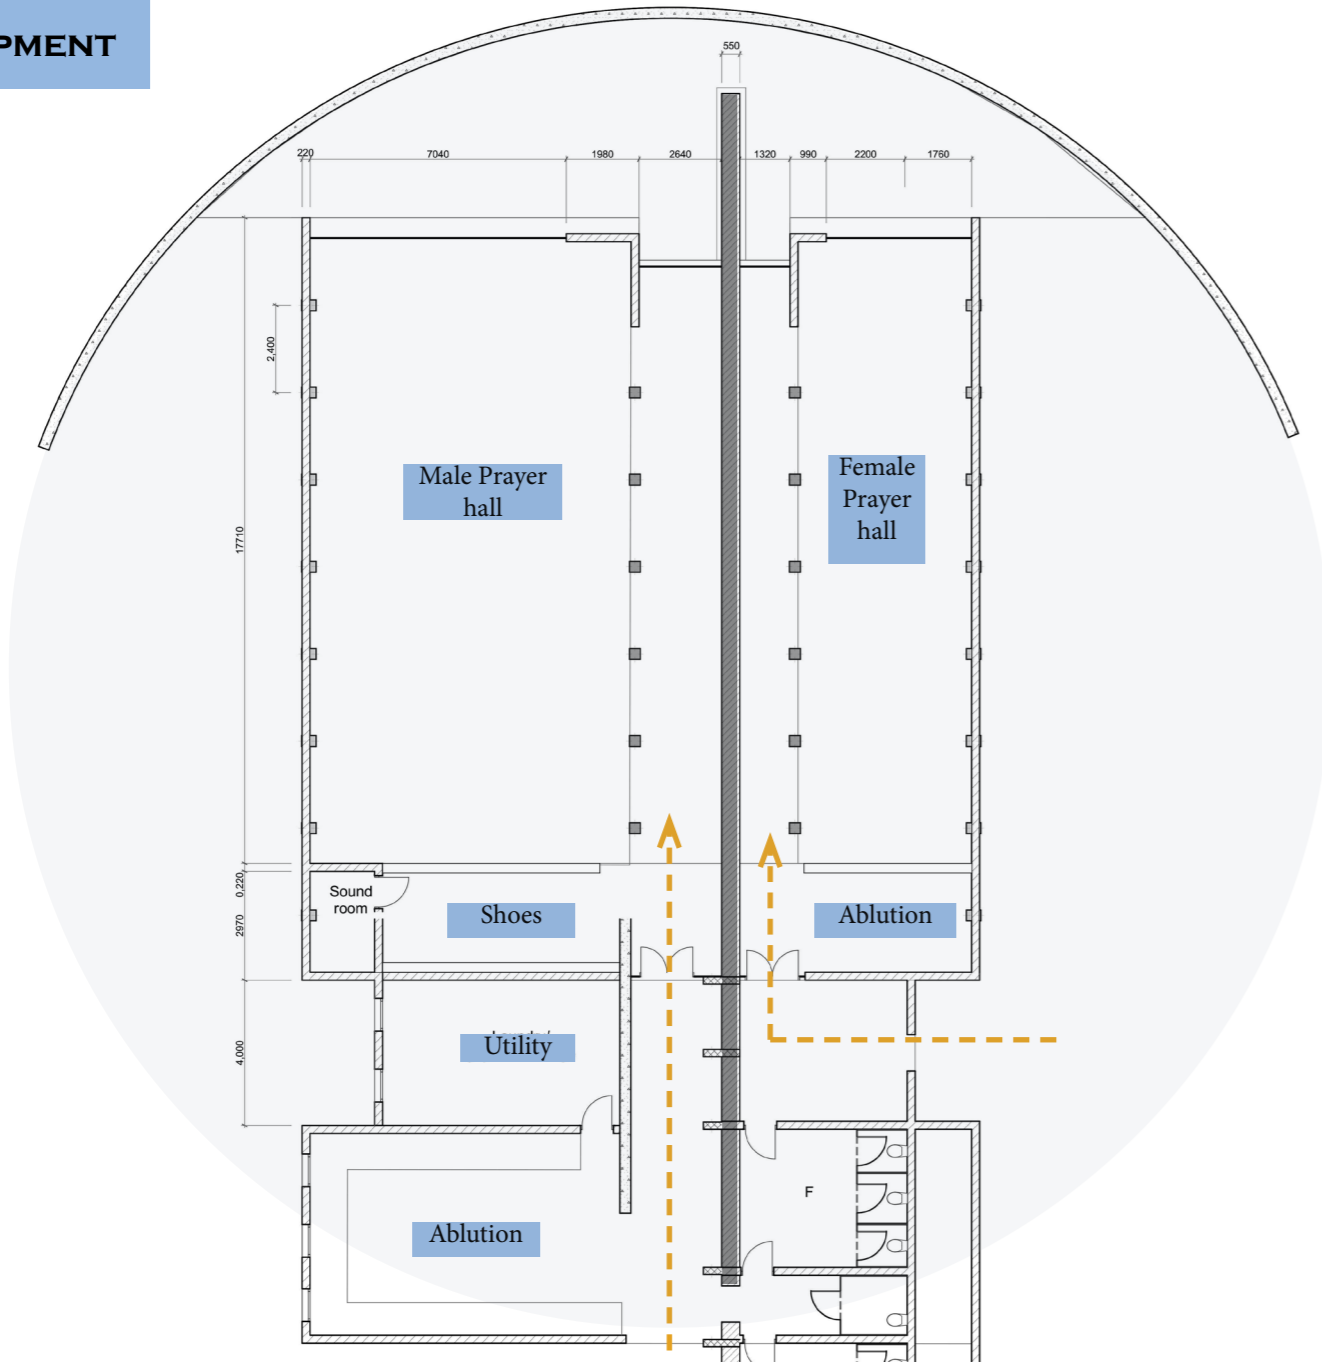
Initial floor plan of mosque -not to scale (Author,2021).
